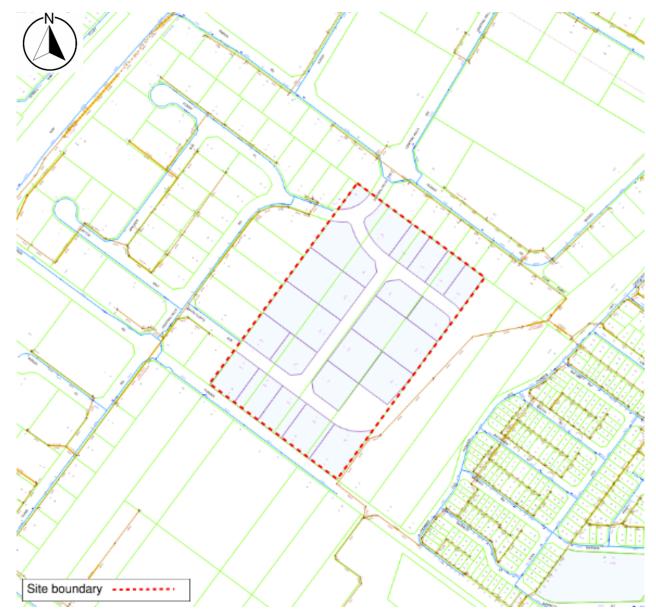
Sydney Water BYDA Plan (Note: Sydney Water Plan references site layout accepted as part of previous Development Application)
